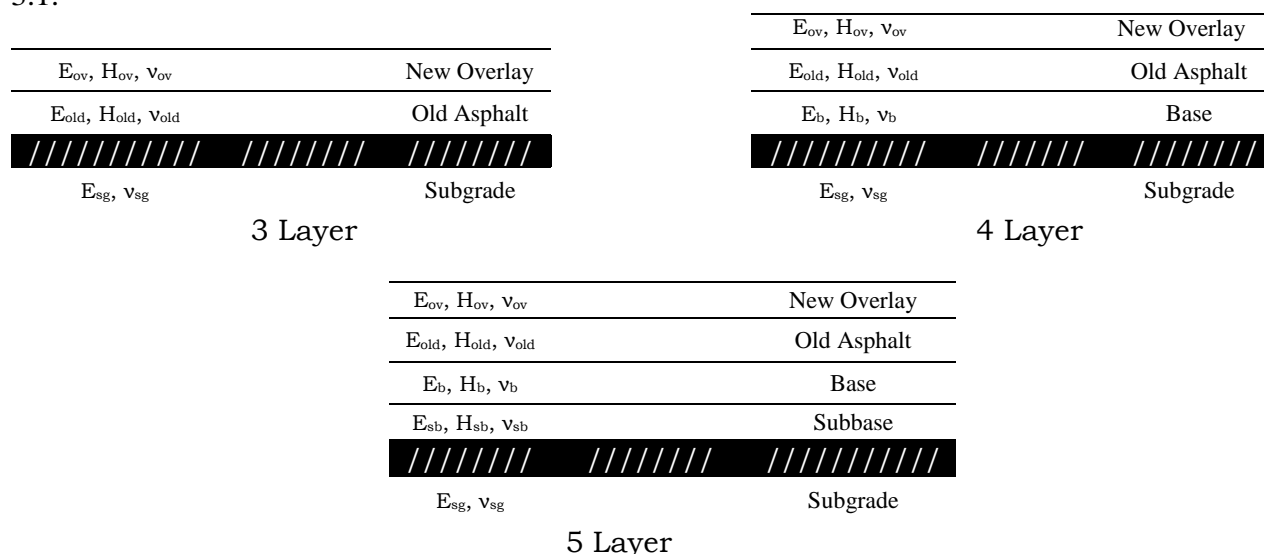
Multi layered Pavement Cross-section (Mostafa, 2009)
